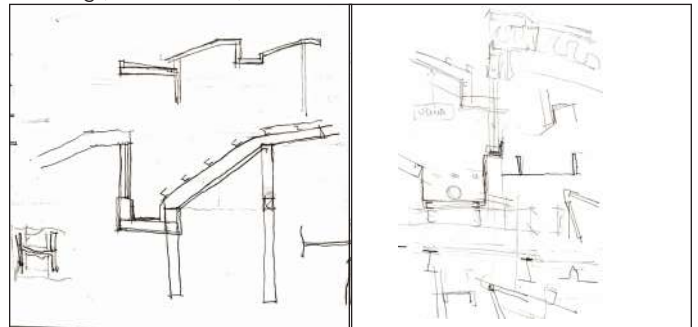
Gym roof structure, gutter and flashing detailing (Author: 2019)
